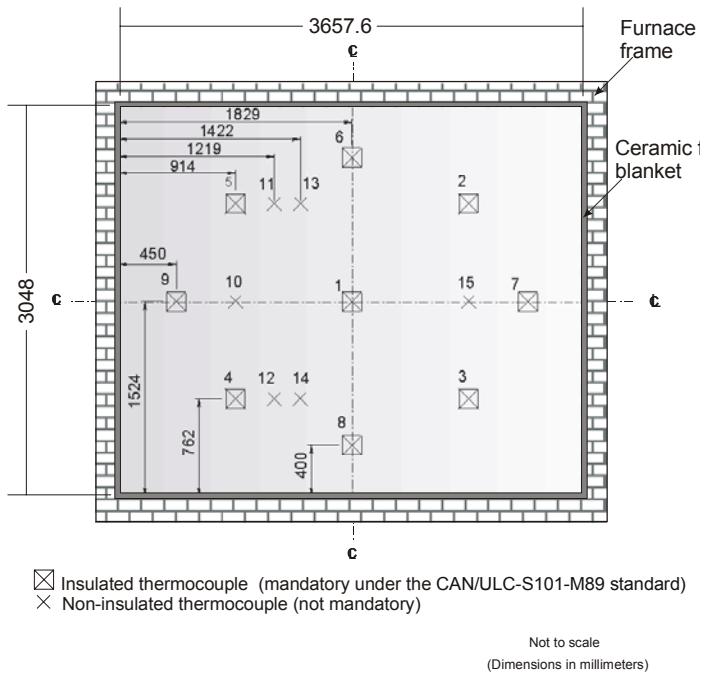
Location of thermocouples on the unexposed surface of an unloaded assembly.
